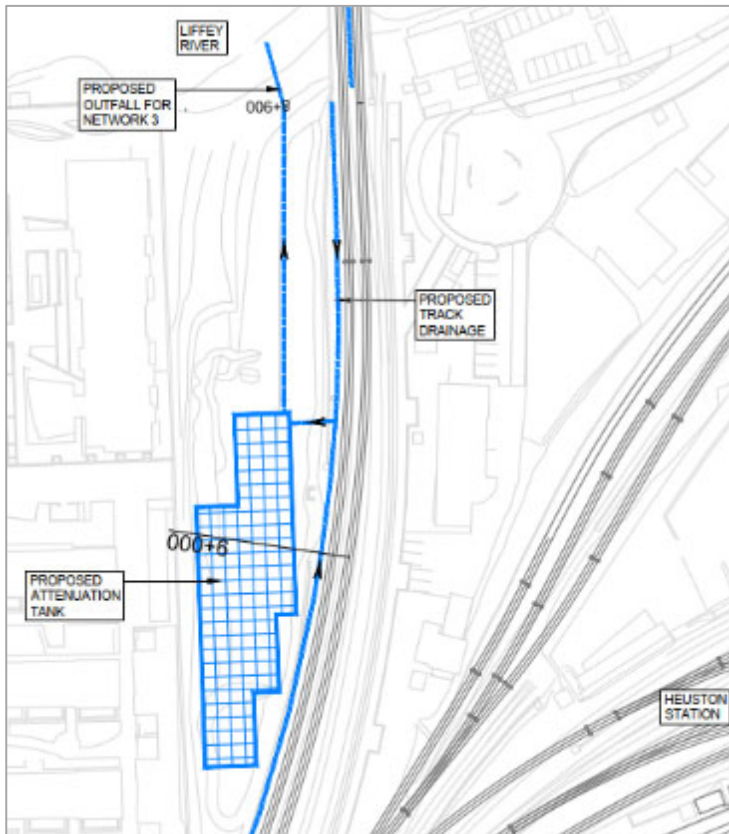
Proposed Track Drainage Layout at Heuston West
